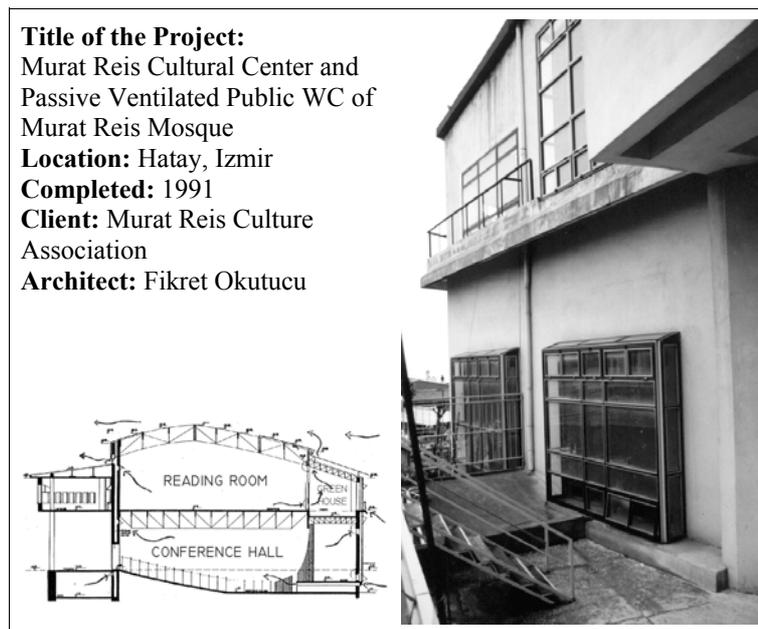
Circulation of air heated by Trombe Walls and the green house at the west façade, and sucked by ventilation chimneys at the east façade (winter case) in Murat Reis Cultural Center, Izmir, Turkey. Photography Zeynep Durmuş Arsan, 1999. Figure Fikret Okutucu.
